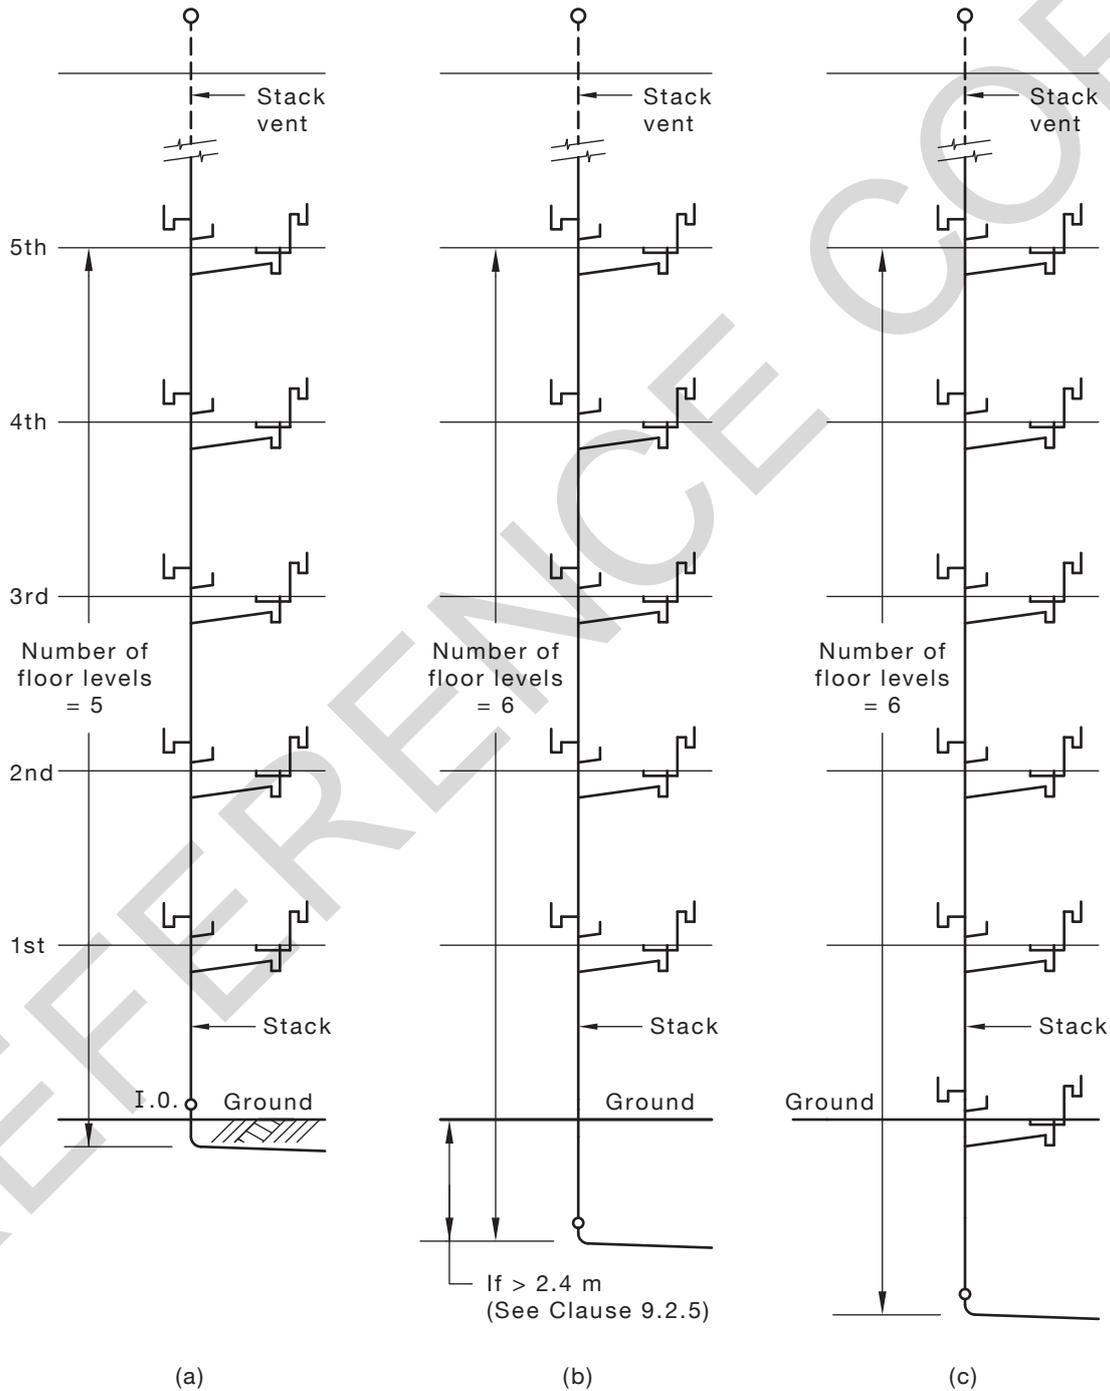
EXAMPLES OF NUMBER OF FLOOR LEVELS
